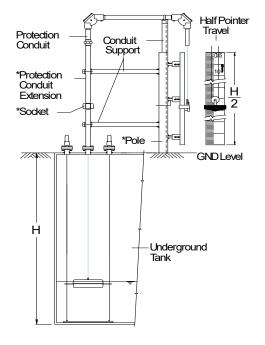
Gauge board with Half Travel Mounted on Underground Tank
